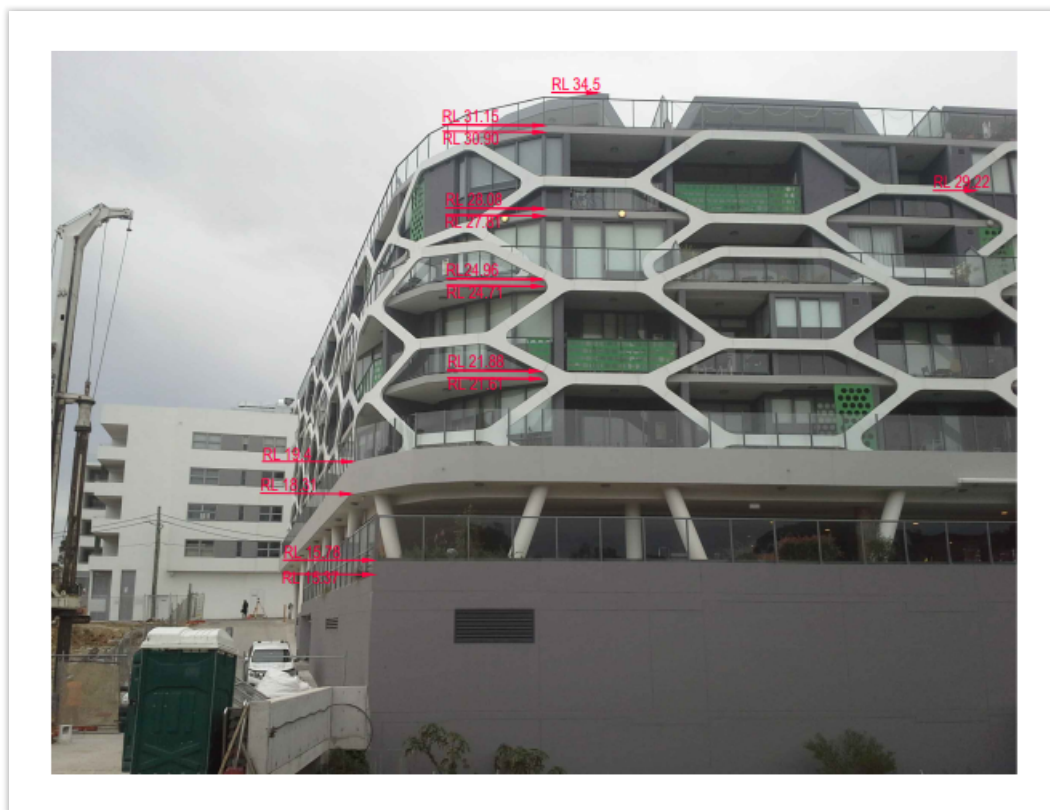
Western Elevation of 20 McGill Street, as viewed from subject site. Photo provided by applicant's surveyor
